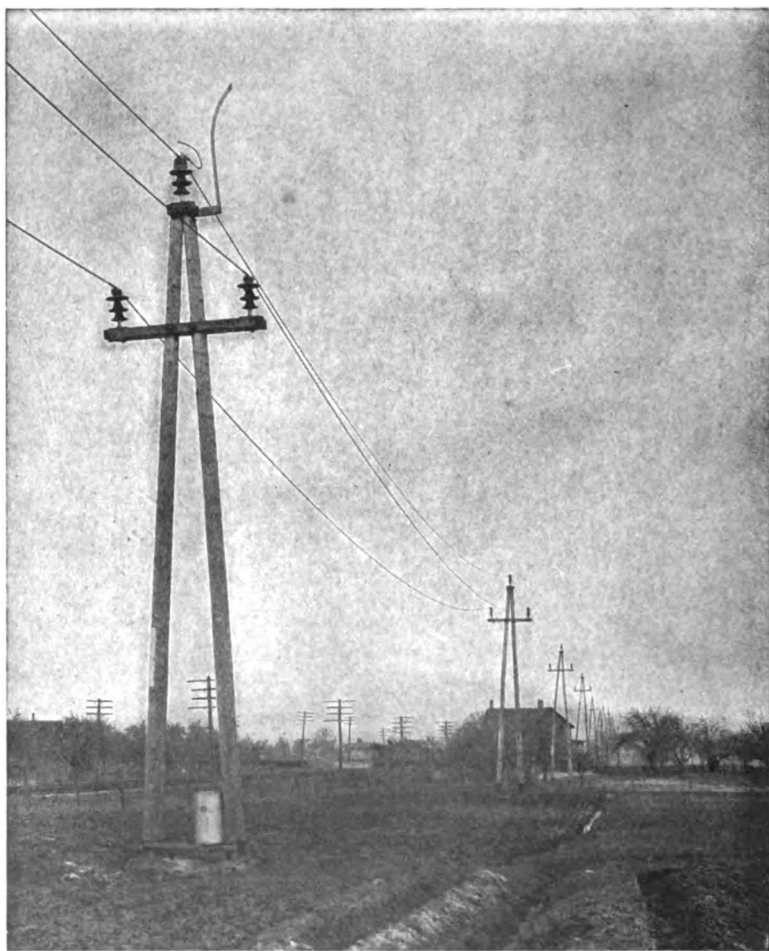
Standard A-frame construction showing line structure lightning-arrester
